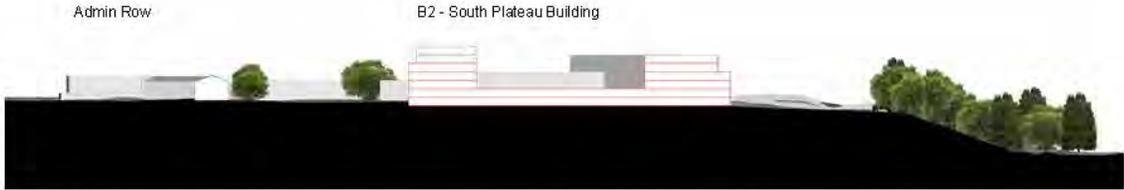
East-West section facing south through Administration Buildings and B2 - Plateau South Building site. Section Key above.
